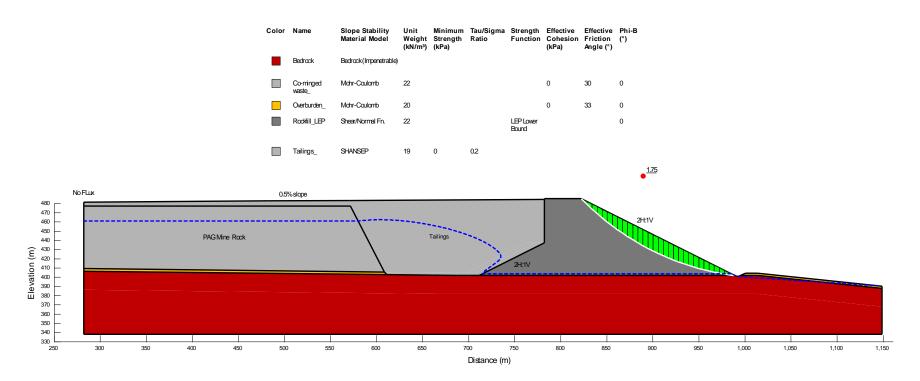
CDF North Cell Perimeter Dam, Typical Section – Stability Analysis of Long-term Loading Condition
